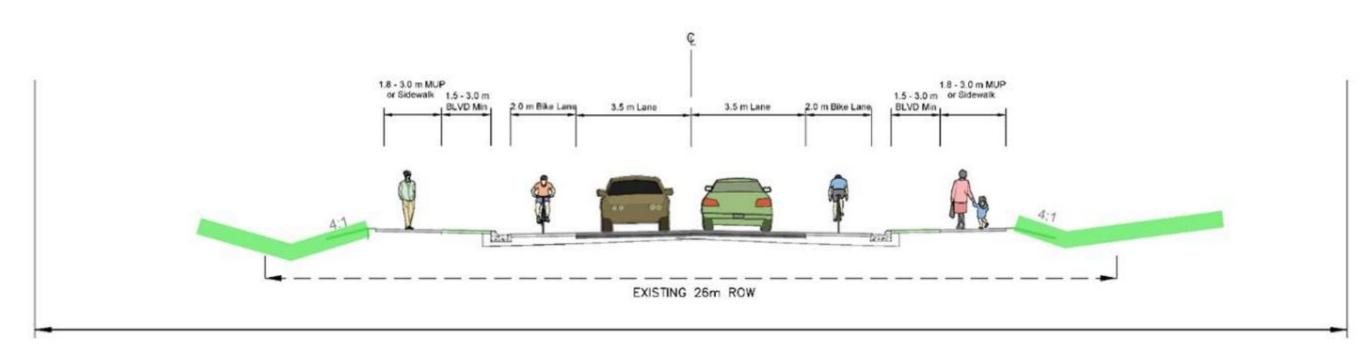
Section 1 Alternative 1 - 2-Lane Urban Cross Section
